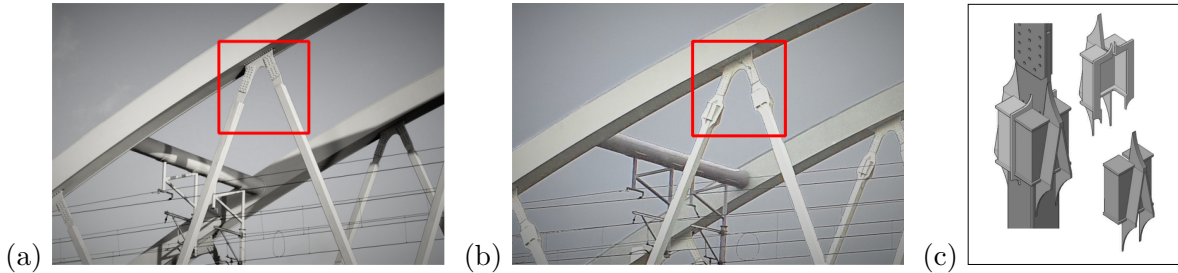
(a) Original connections between the diagonals and the arches and the bridge deck and (b) connections after retrofitting, and (c) detail of the steel boxes welded around the original bolted connection.
